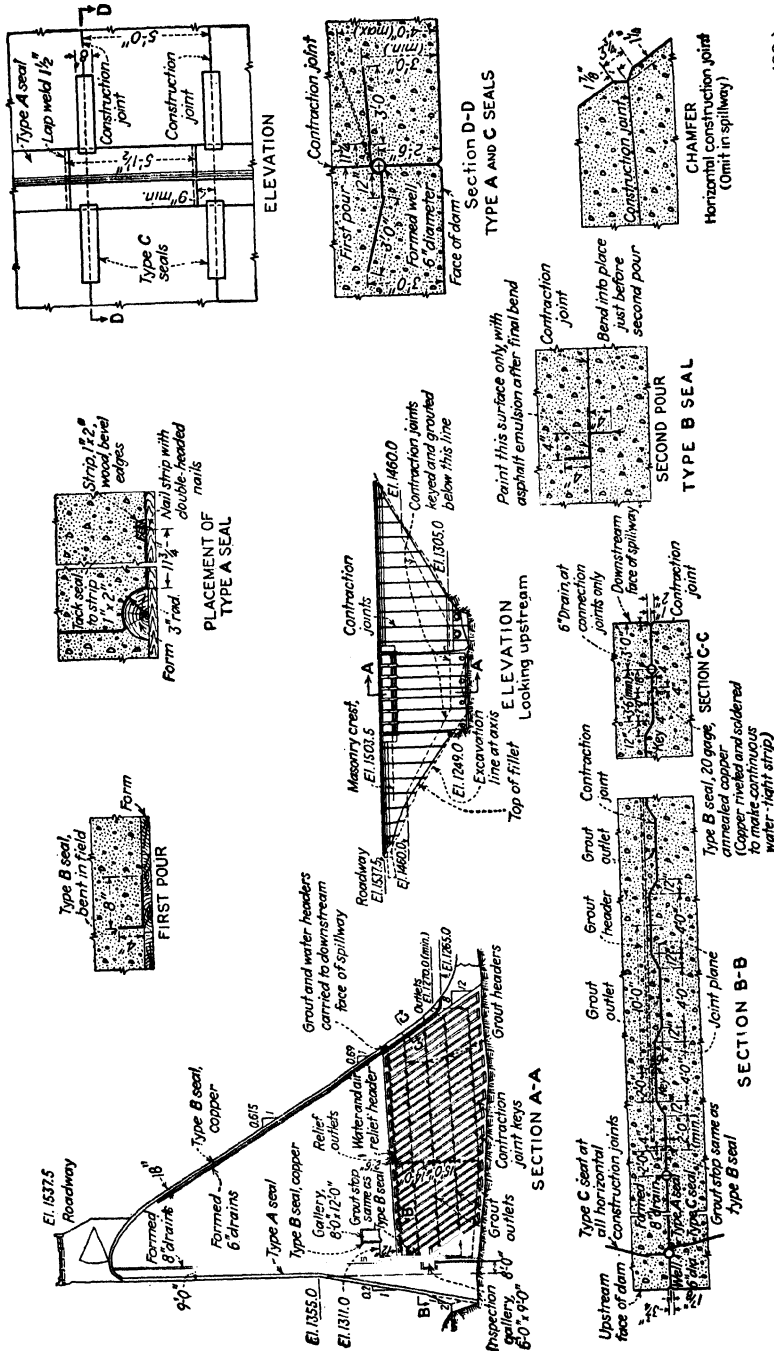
Construction details, Hiwassee Dam. (From Cecil E. Pearce, *Design of Hiwassee Dam*, Civil Engineering, July, 1940, p. 433.)
